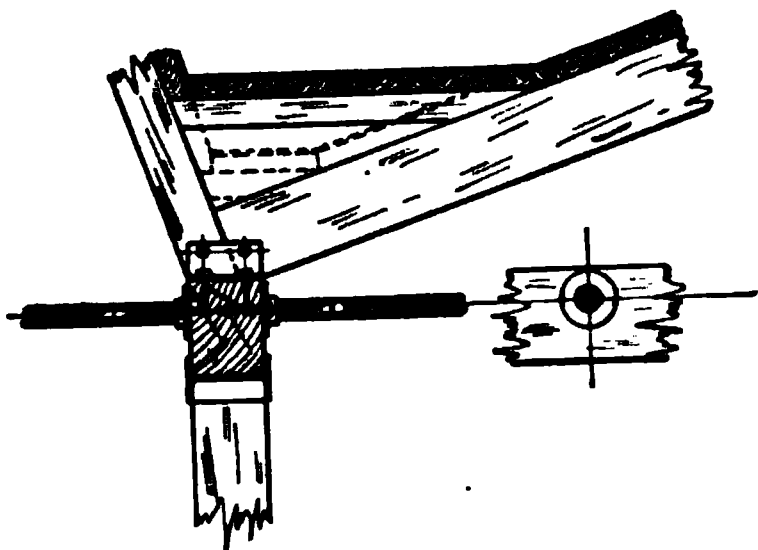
Detail of saw-tooth frame—inclined face with pipe ties.
